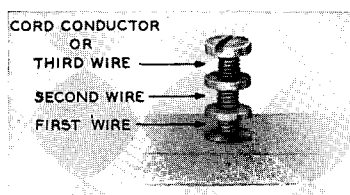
CONNECTING BLOCKS—TERMINATIONS
